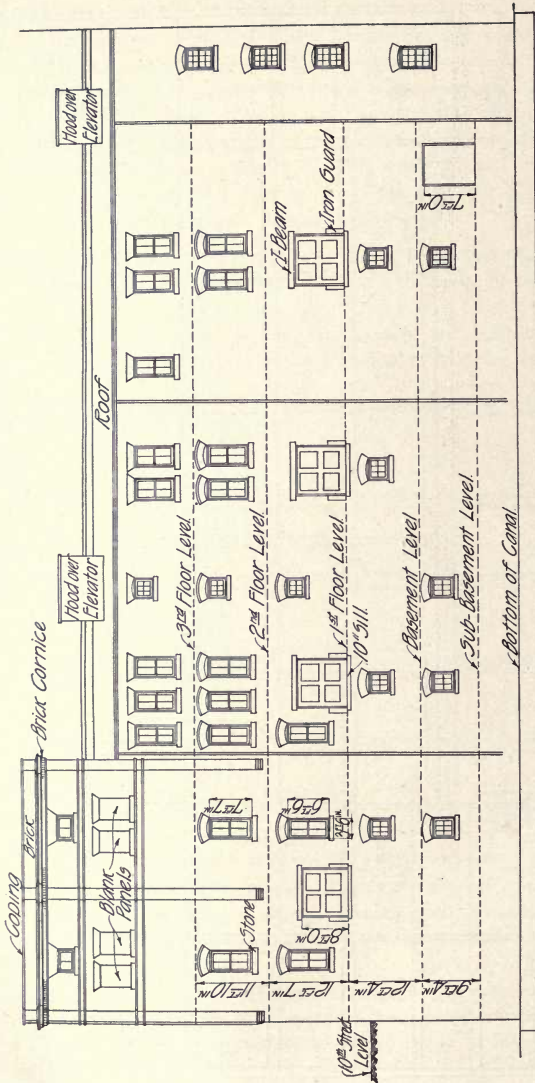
South Elevation of Forbes Cold Storage Warehouse. (See p. 160.)
